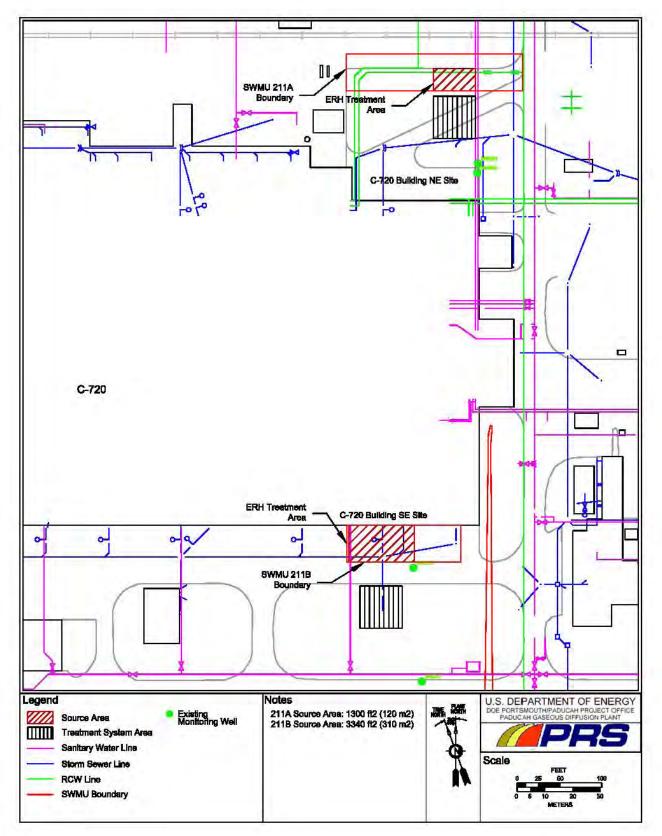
Plan View of Alternative 5 at C-720 Northeast and Southeast Sites
